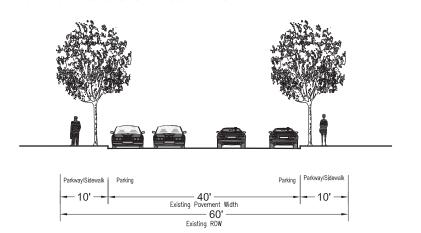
TYPICAL SECTION - PALM AVENUE AND FIRST STREET
